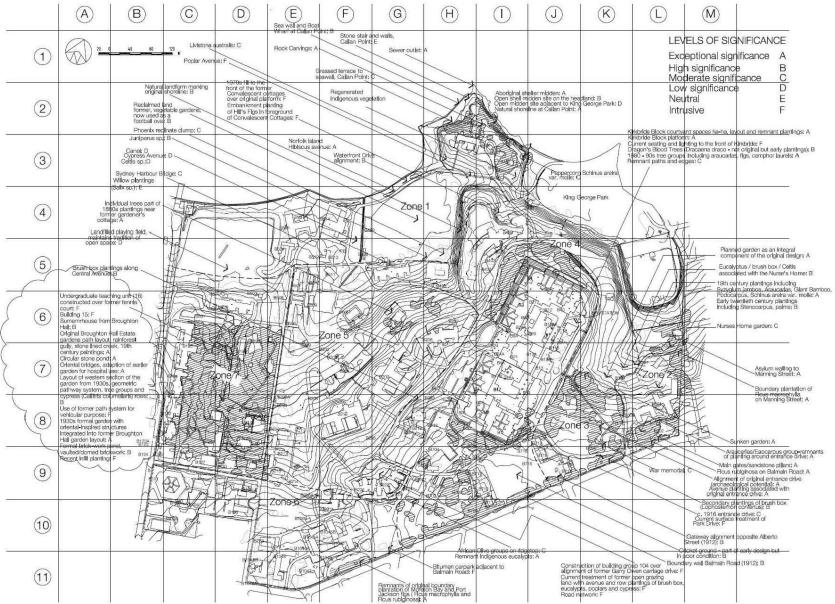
Site Plan showing Levels of Significance of Landscape Elements. Source:
